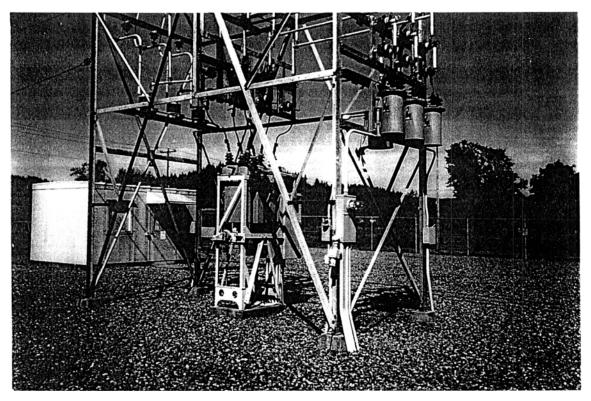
VIEW OF CIRCUIT BREAKER BANK CONNECTED TO POWER TRANSFORMER #T-741 VIEW IS TOWARDS THE NORTHWEST.
